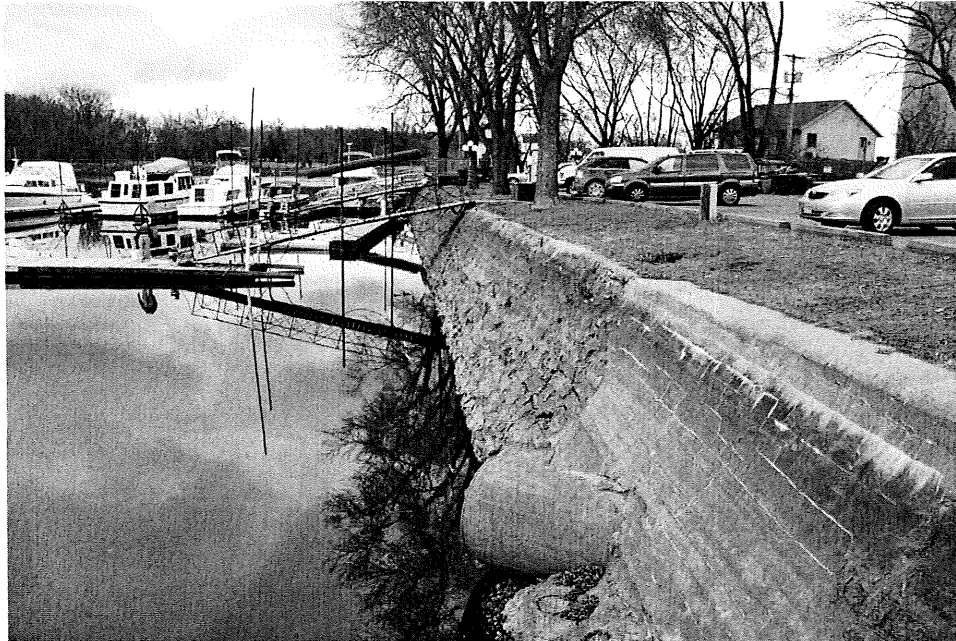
ca. 1300 Levee Rd. Red Wing Yacht Club, poured concrete wall (1937) with modest concrete repair in foreground at a drainage pipe outlet; eastern parking lot in view (facing NE)
